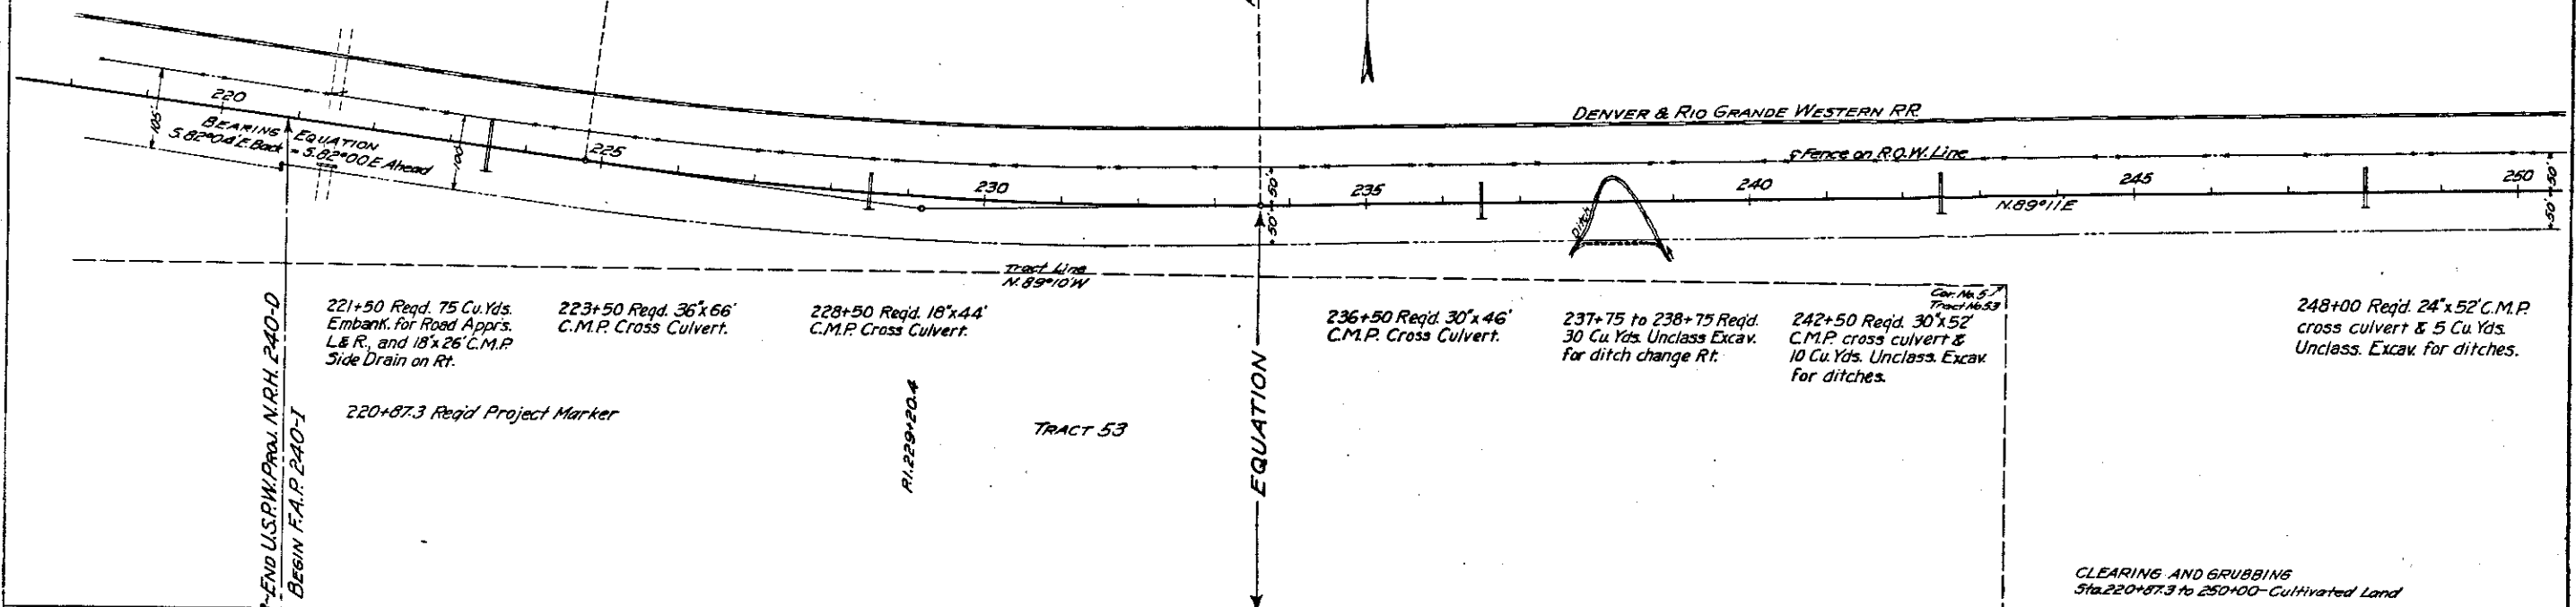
PLAN PROFILE & P. & B. & E. DRAWING
